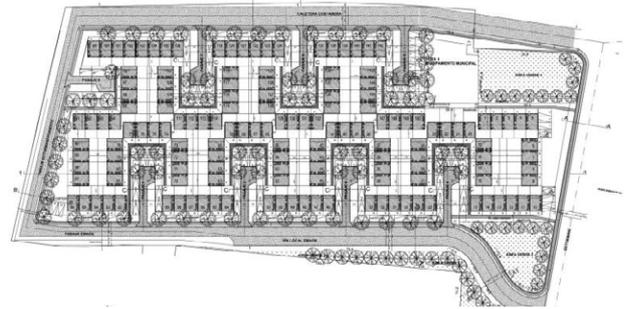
site plan, first floor plan of Pudahuel source: Alejandro Aravena, Andres Iacobelli. *Elemental : Incremental Housing and Participatory Design Manual*. Hatje Cantz, 2010
